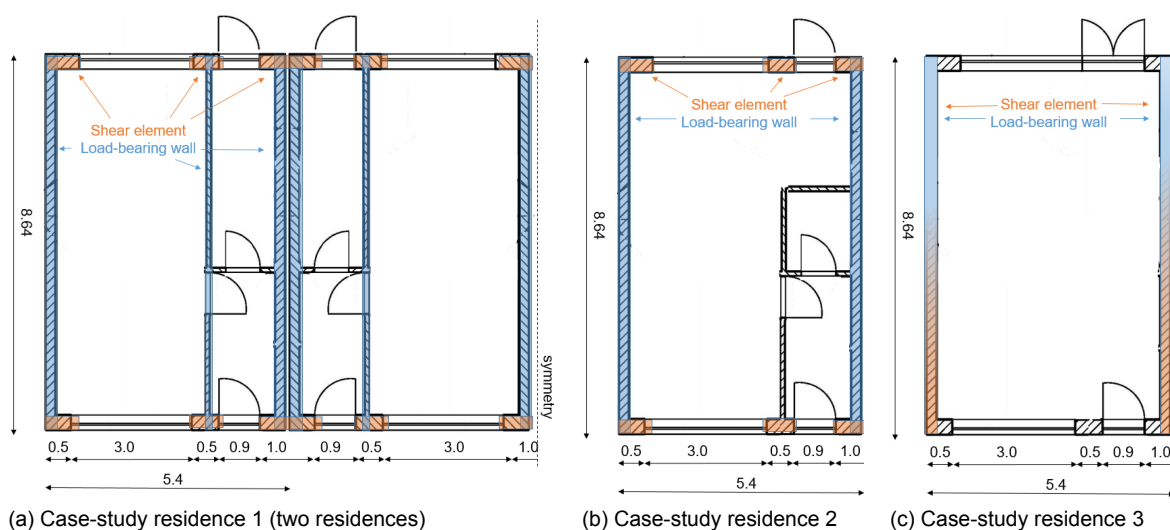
Common floorplans of typical Dutch terraced houses with their key-elements
